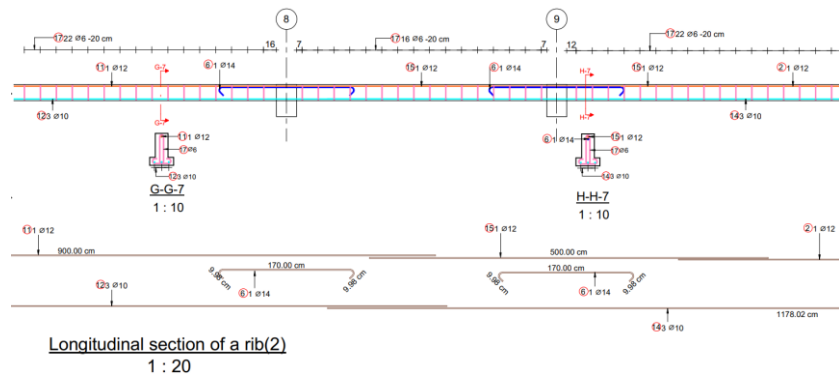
Longitudinal cross-section of the rib (part 2)
